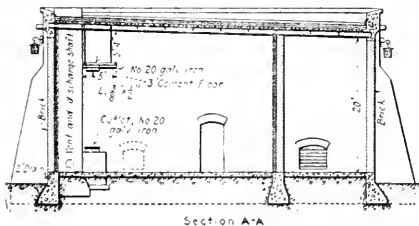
Cross Sections of Noiseless Substation showing Construction of Walls and Roof
